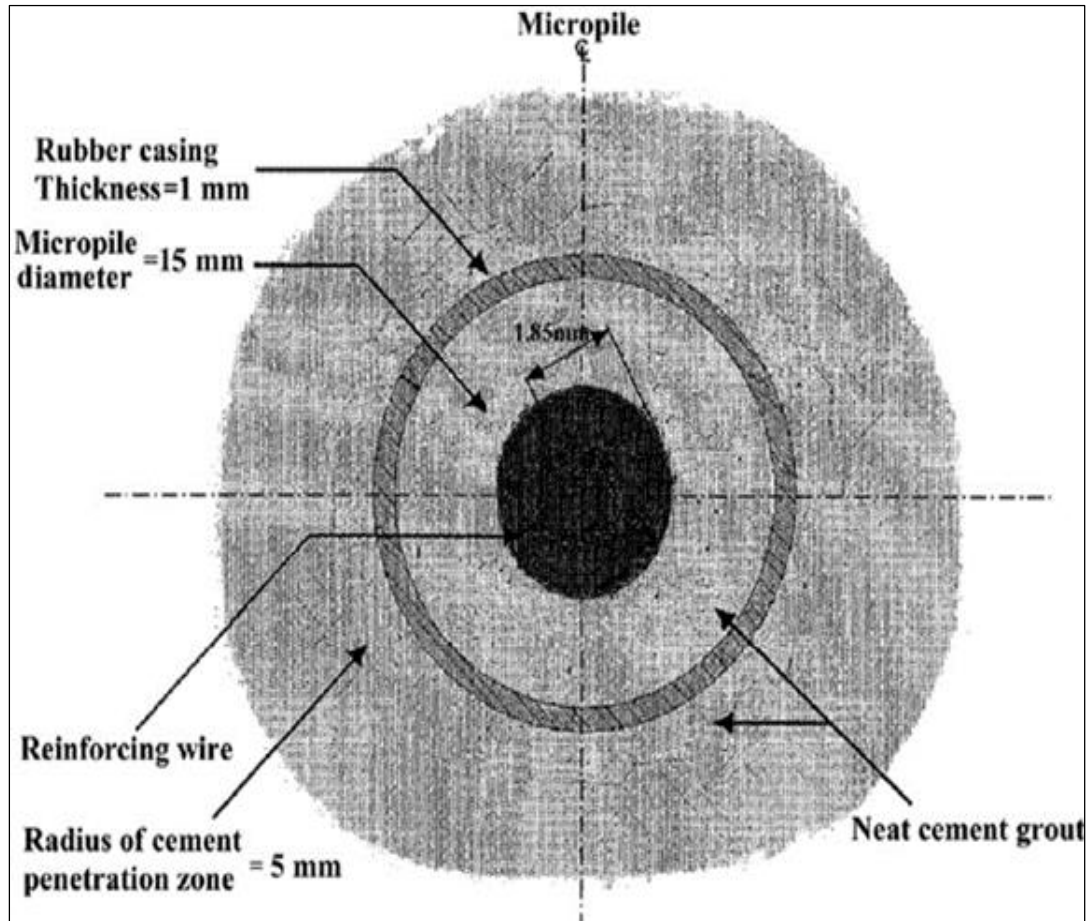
Cross-section view of micropile installation and load transfer mechanism
